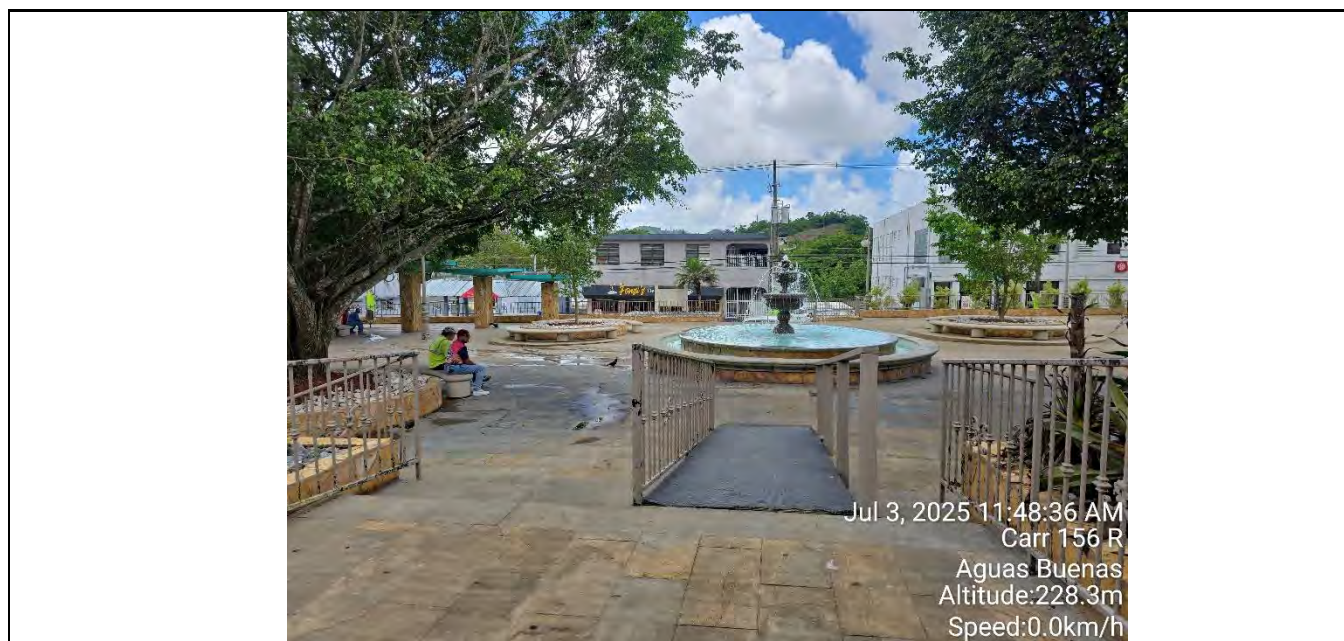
Description: Plaza interior, temporary ramp, facing south.
